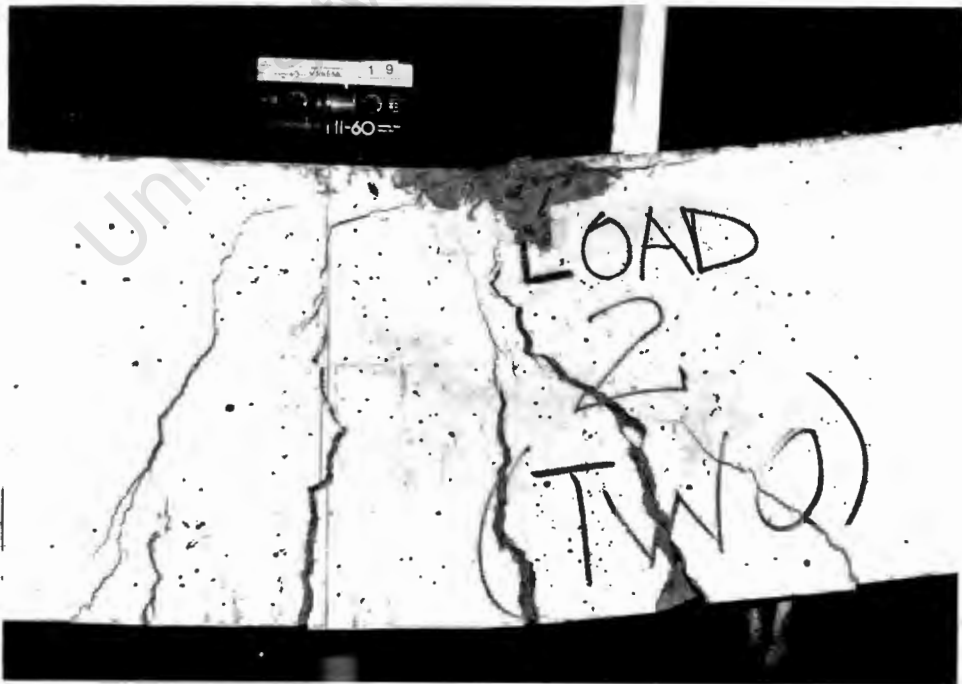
Tensile cracking under Load Two - beam FS5 at failure.
